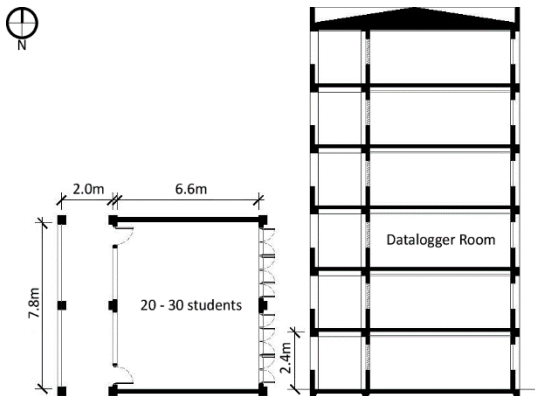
Plan of observed classroom and position in section of Rizal High School: Science Building, a typical DepEd structure
